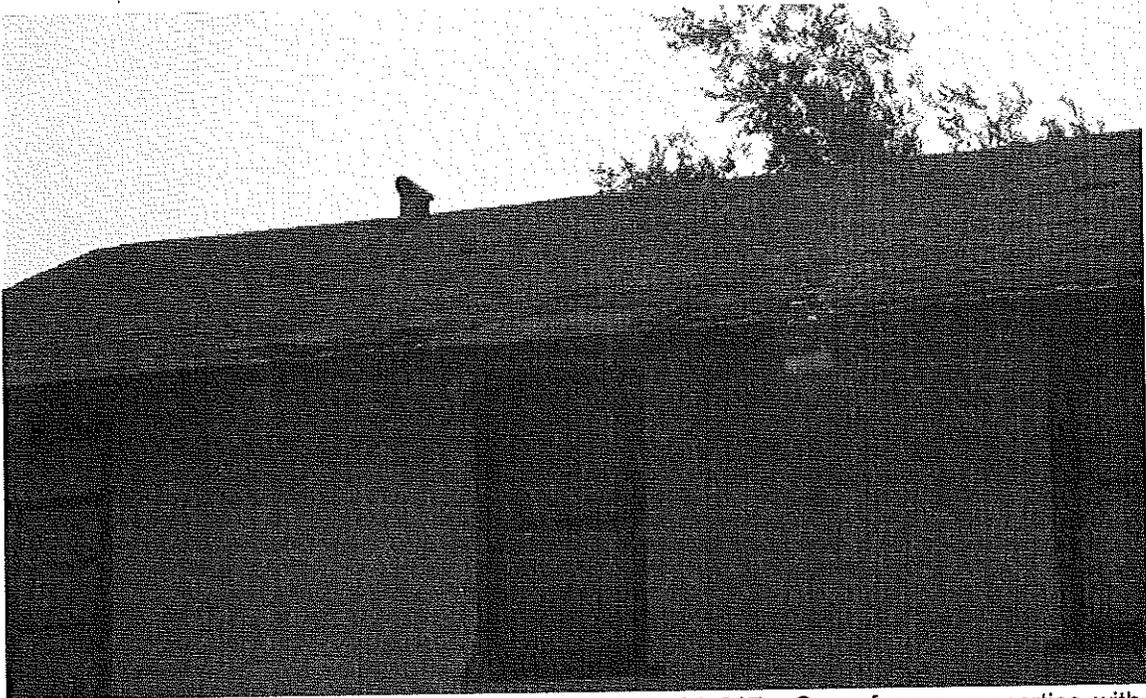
3800 Block of Huron Street, APN 251 0081 017: One of many properties with roof damage.
